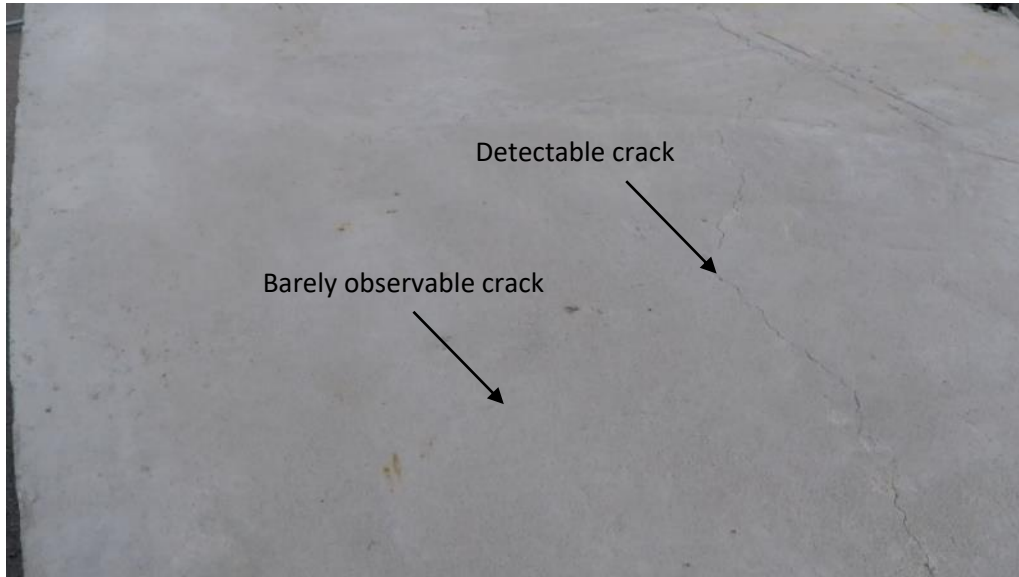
Variety of cracks' Dimensions on the Bridge Deck, E001
